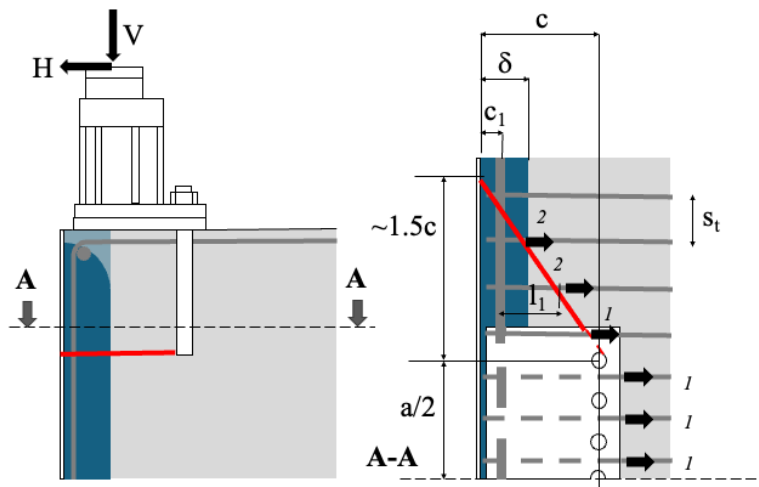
Concrete edge failure of reinforced concrete (red) and in-service irradiation damage (blue).
